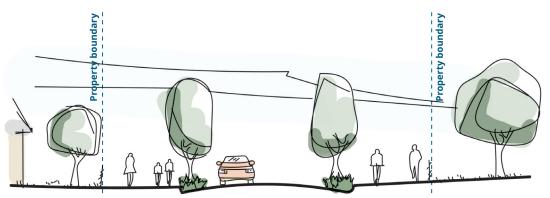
Cross section example - Secondary Road (with cycleways)- 16m
